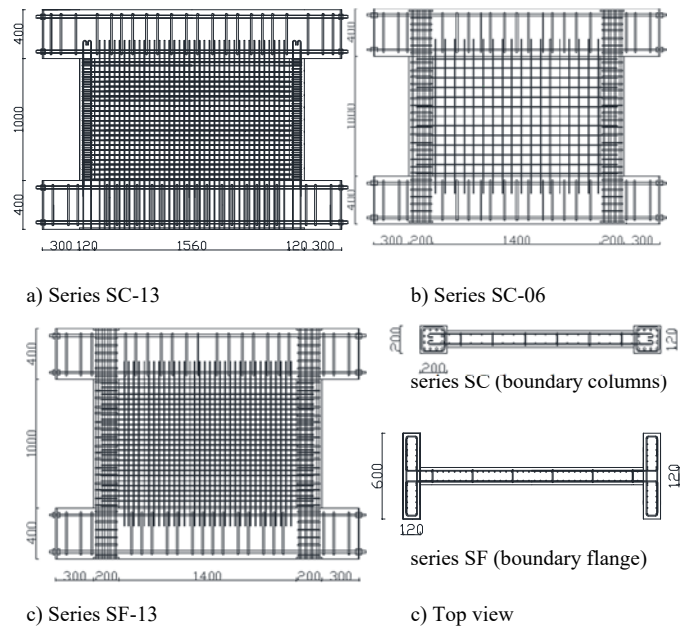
Dimension and reinforcing details of specimens: (units in mm)
